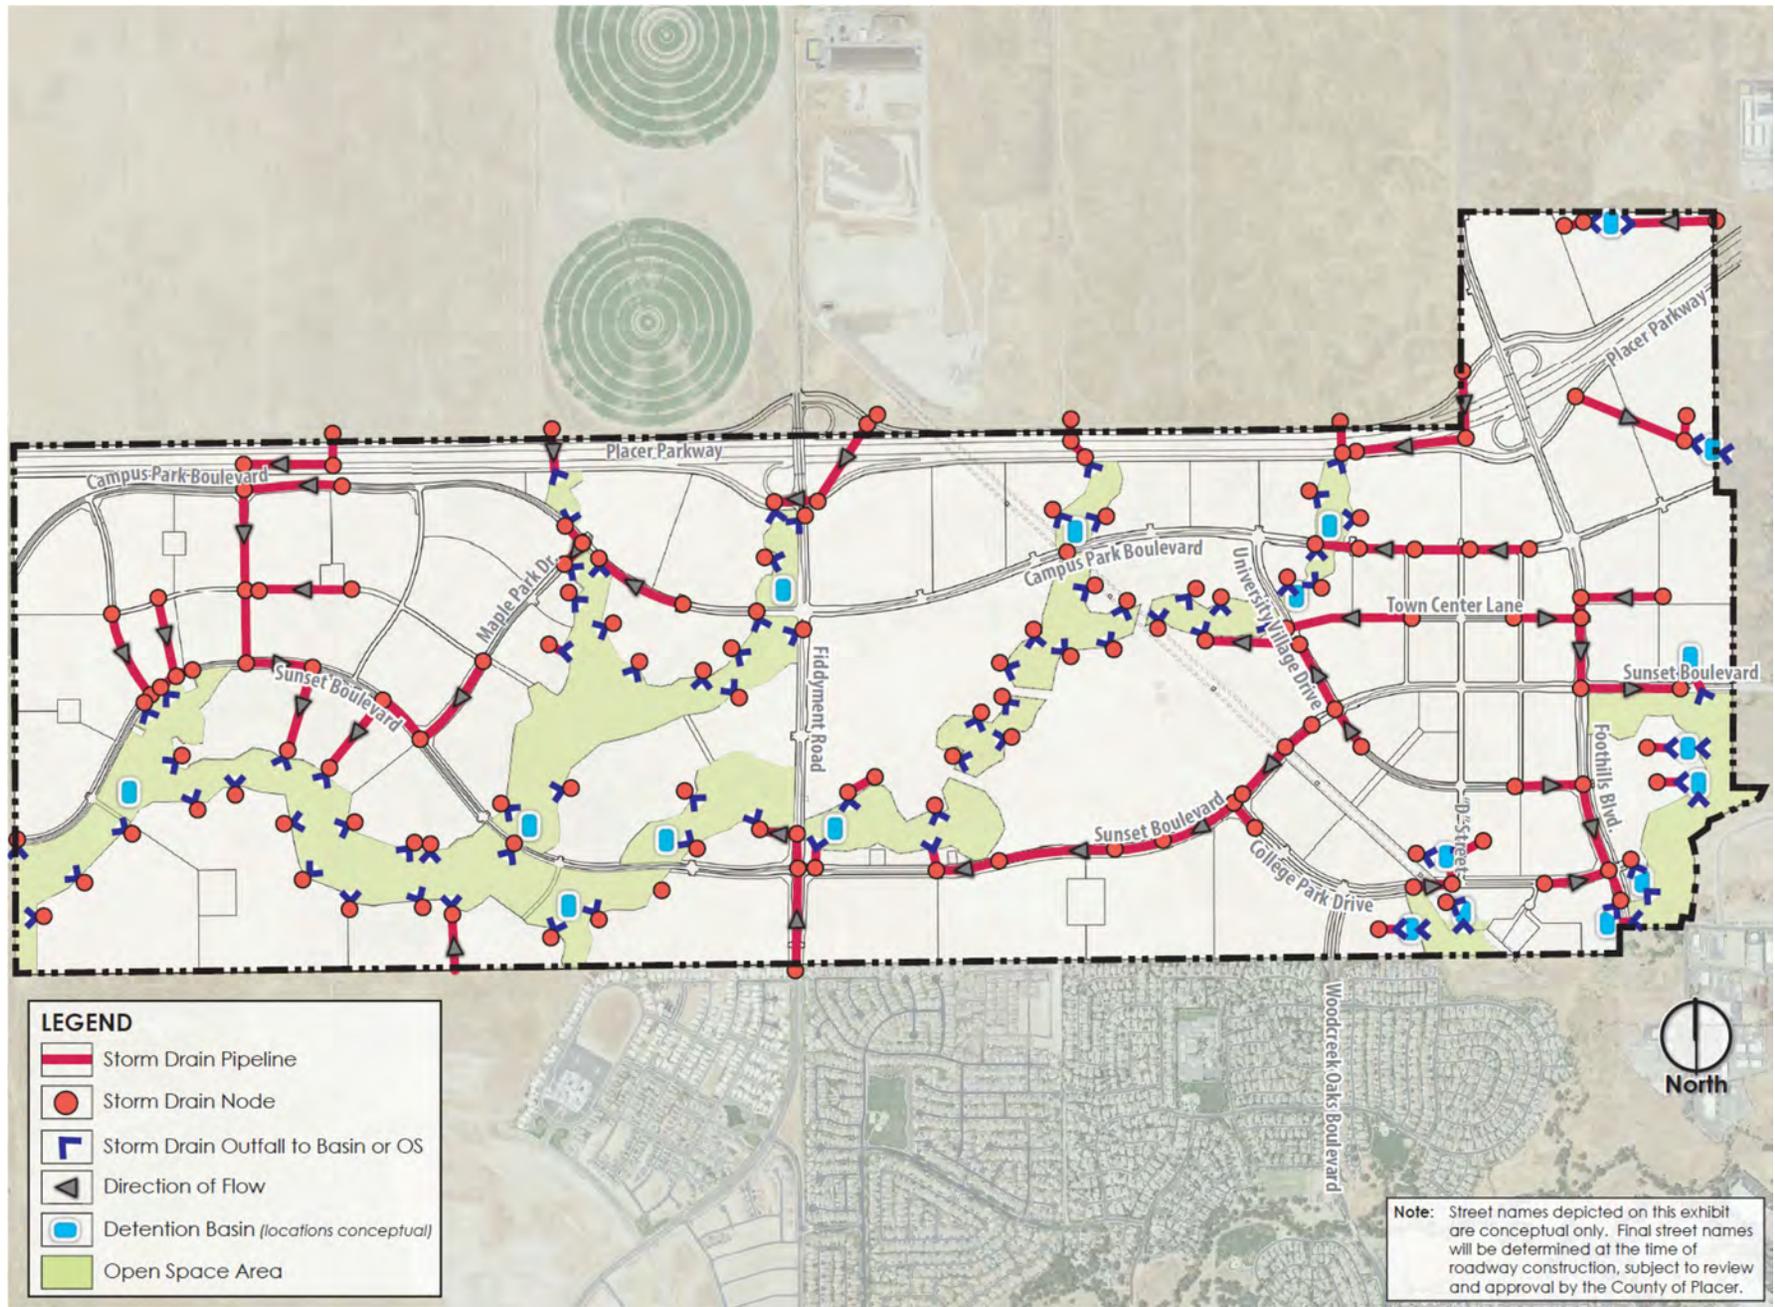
STORMWATER DRAINAGE INFRASTRUCTURE
